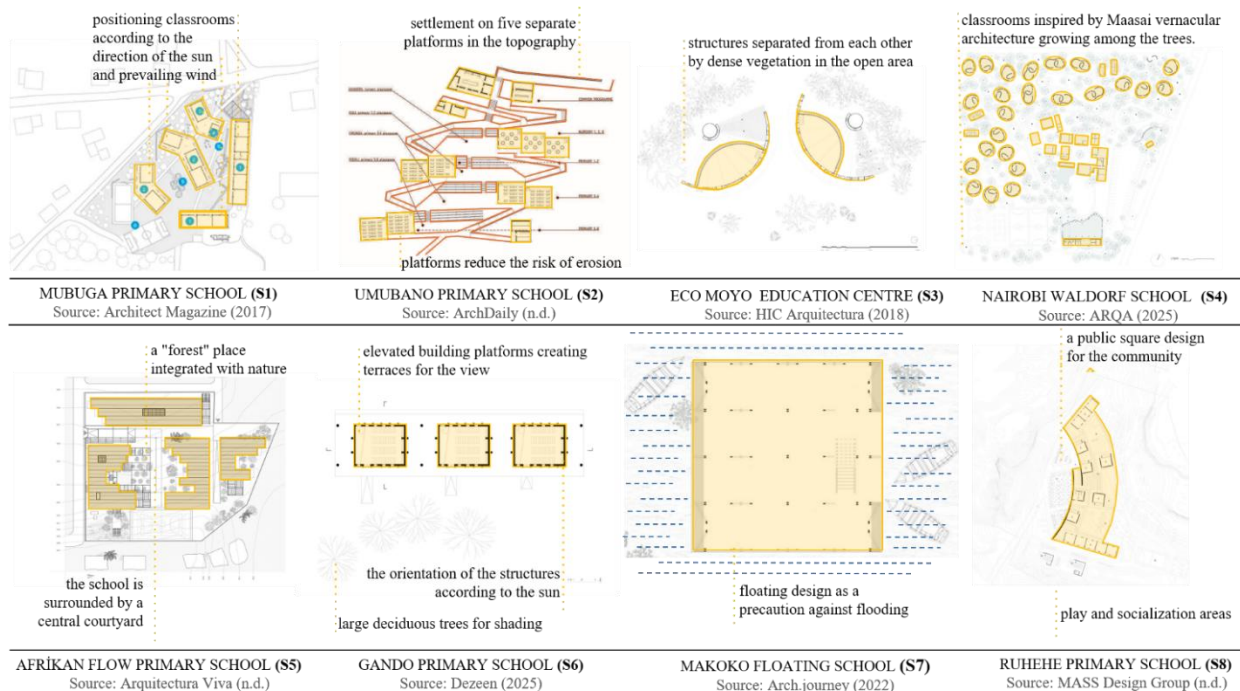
Site or ground floor plans of schools (Authors, 2026).
